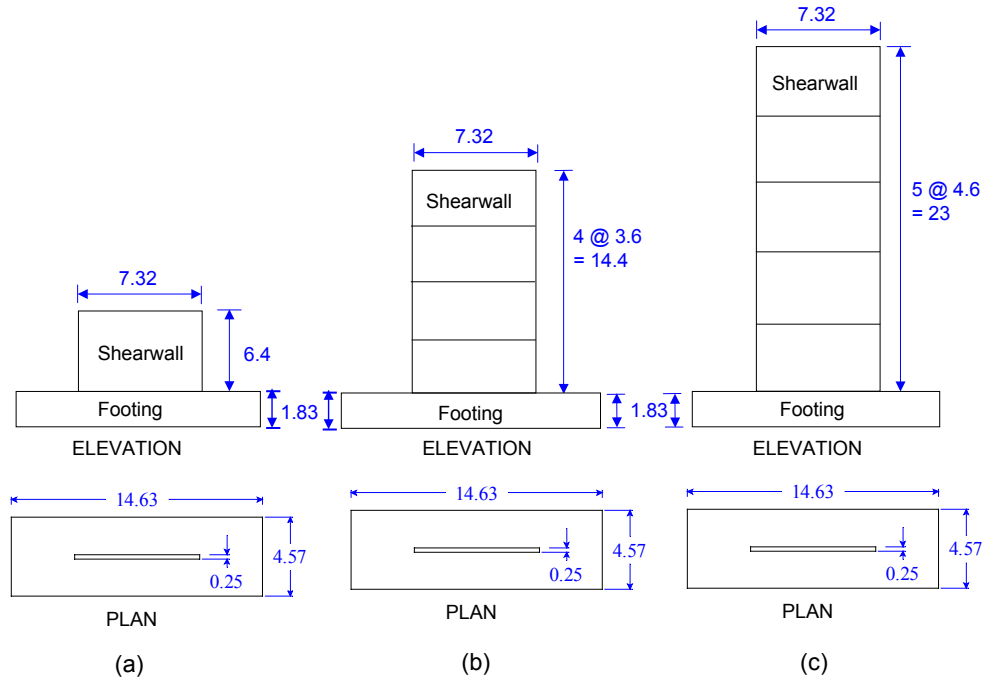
Geometry and dimensions of the shearwall-footing models (units in m): (a) 1-story building, (b) 4-story building, (c) 5-story building
